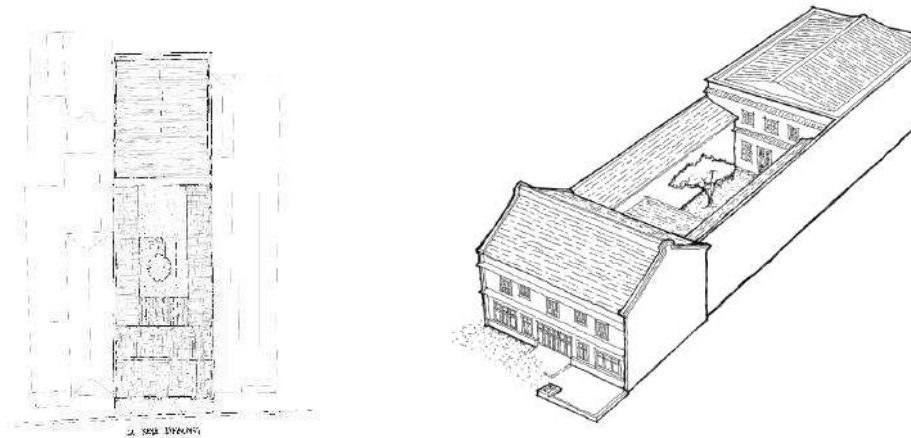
& 37 Situation Plan and Isometry of Building No.8 Residential Function Type Shophouse
